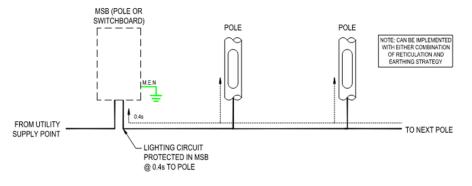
Earth fault protection with 0.4s disconnect at switchboard
